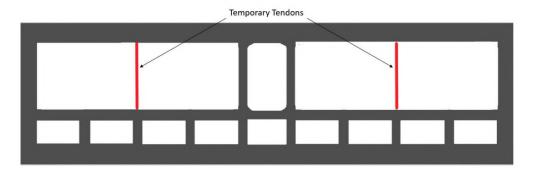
Temporary tendon placement layout (Hanusaik, 2021)
